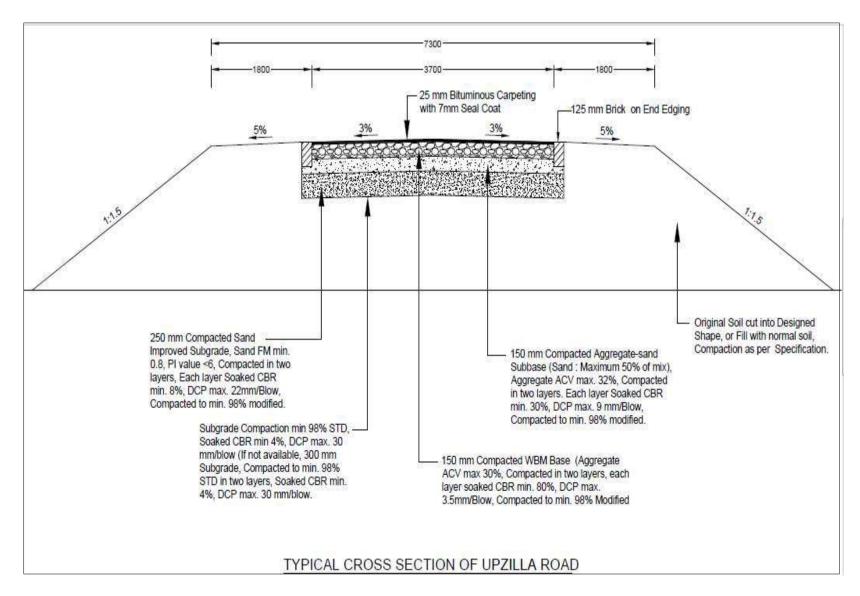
Typical Cross Section of Upazila Road (LGED, 2005)
